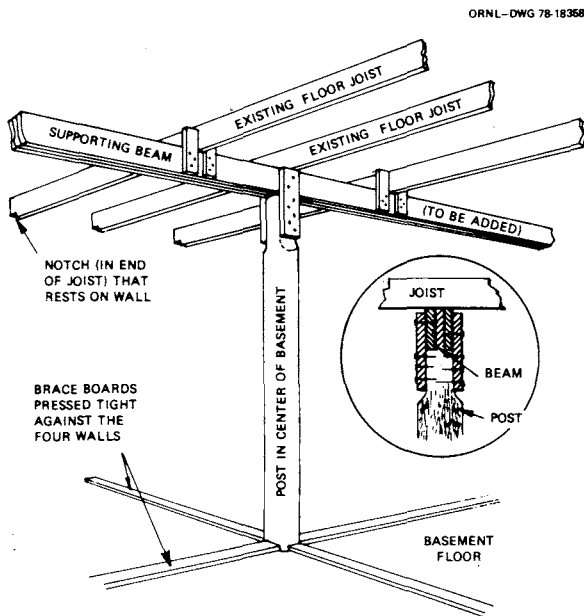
Supporting beam and one of its posts installed to increase the load of shielding material that can be carried safely by the floor above a home basement.
